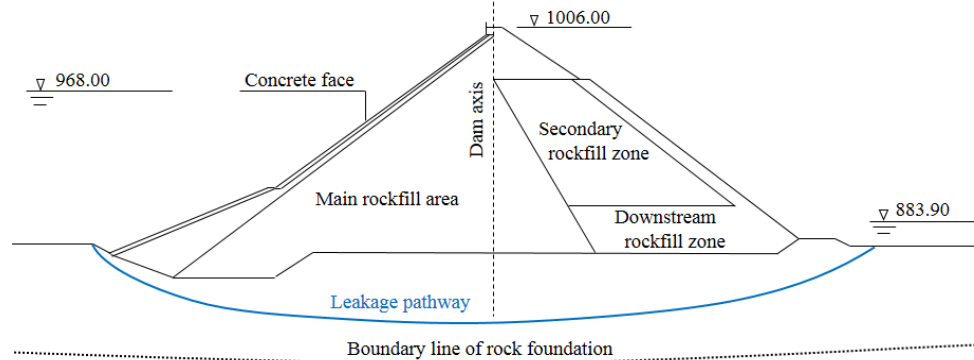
Typical profile of CFRD (unit of water level and elevation: m). Normal water level is 968.00m, downstream flow measurement weir level is 883.90m, crest elevation is 1006.00m.
